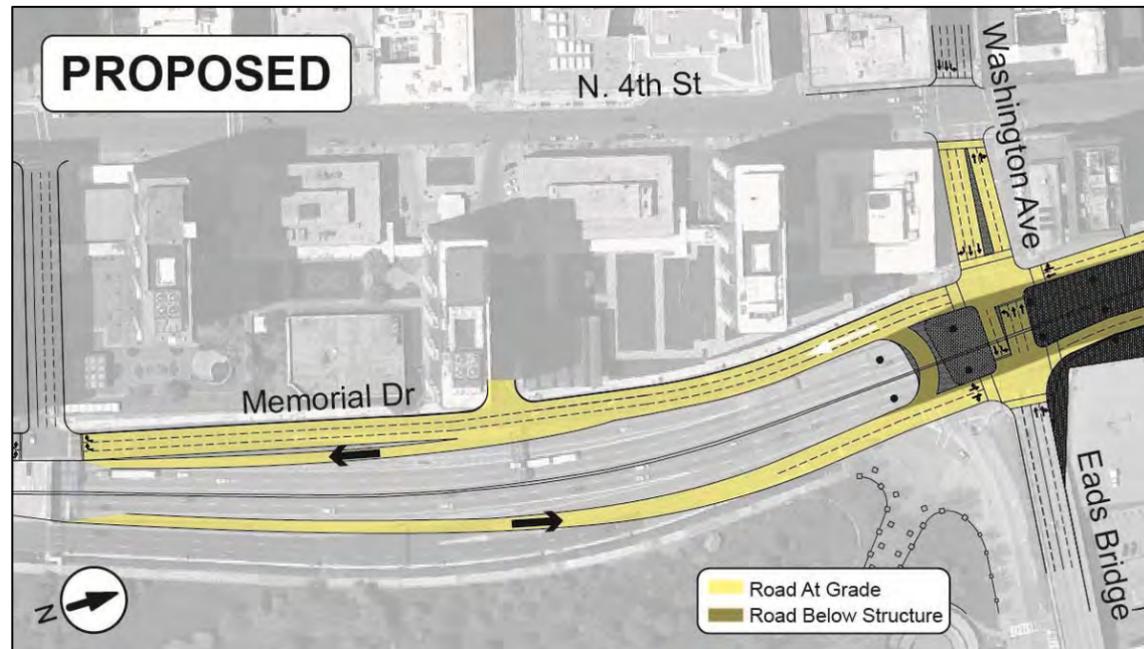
Proposed Layout of Washington Avenue Ramps and U-turn
